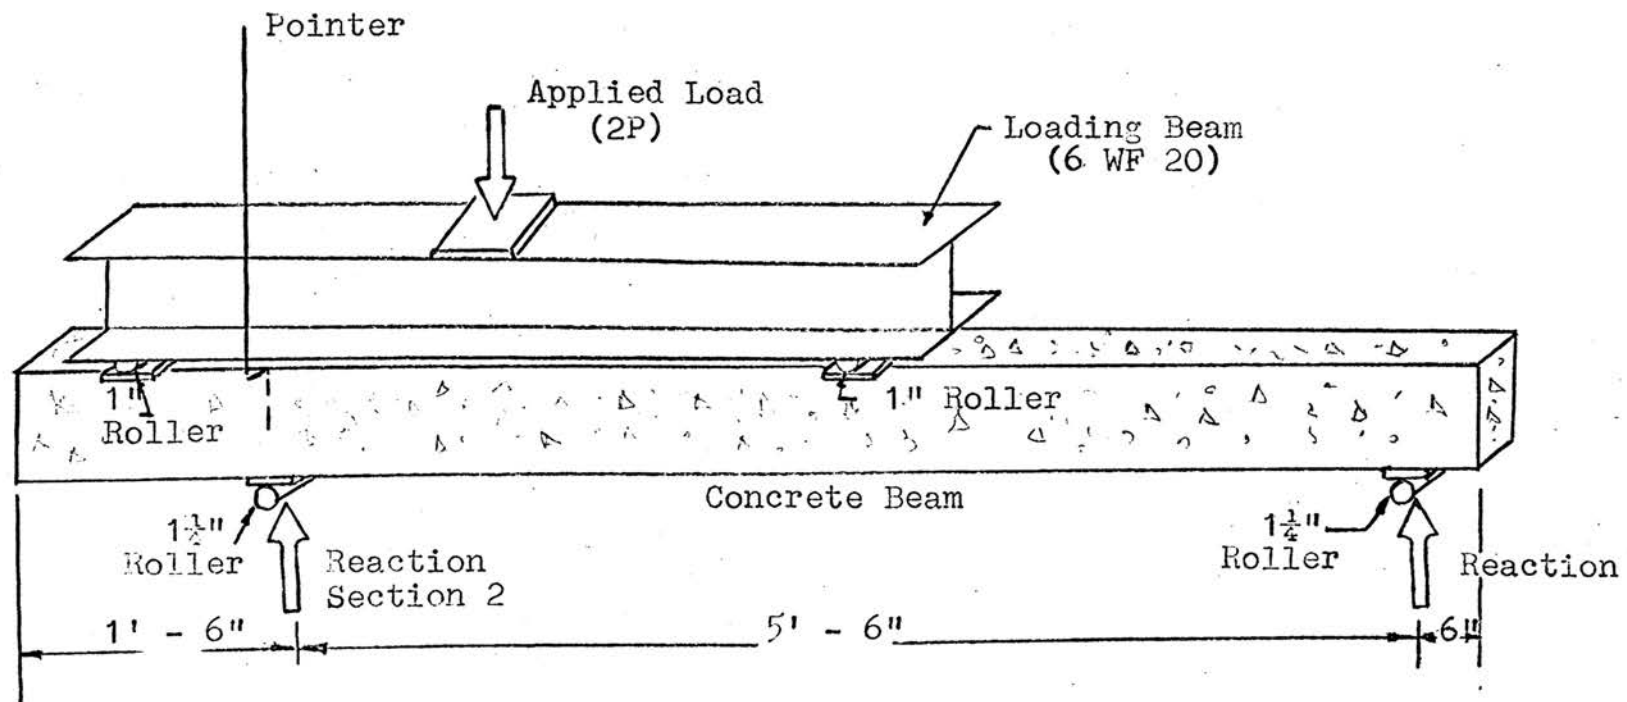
APPLIED LOADING APPARATUS DETAIL
